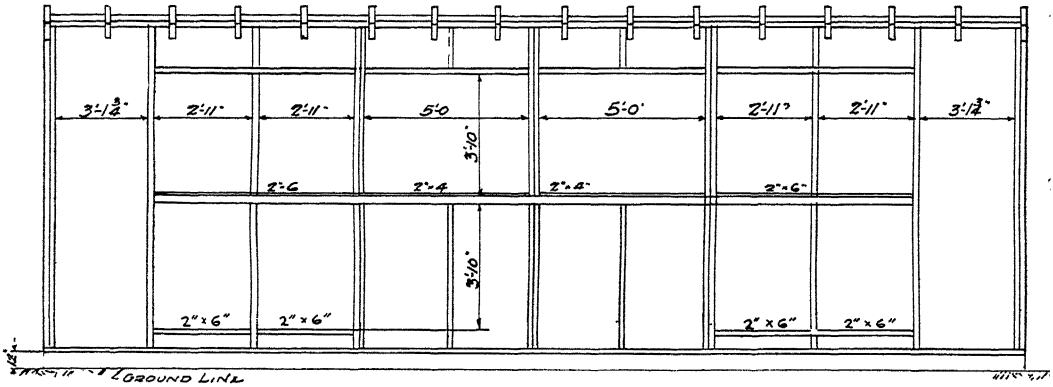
Front framing plan of one unit, 30 feet long. It will be seen how the windows fit in between the studs, making window frames unnecessary. Notice that each window sash rests on a 2- by 6-inch sill.
